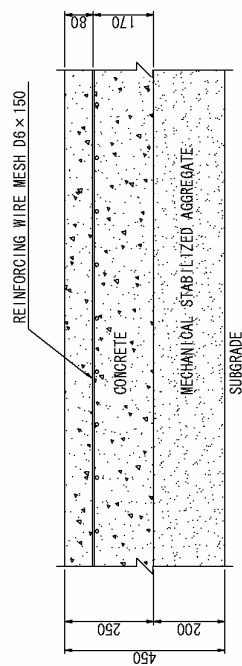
(29) Access Road Junction Structure in Port of Namibe
